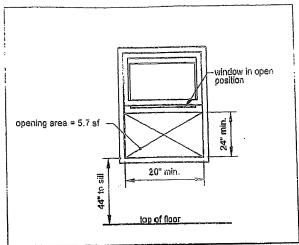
WINDOW EGRESS REQUIREMENTS
